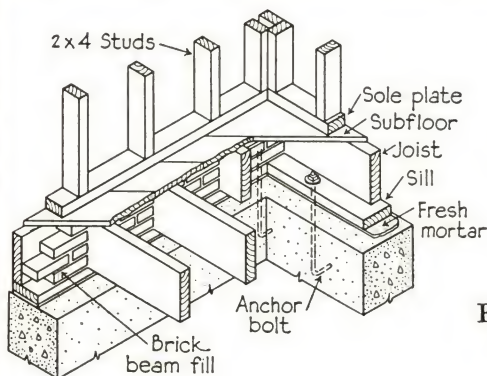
BOX SILL ASSEMBLY WITH SILL PLATE
